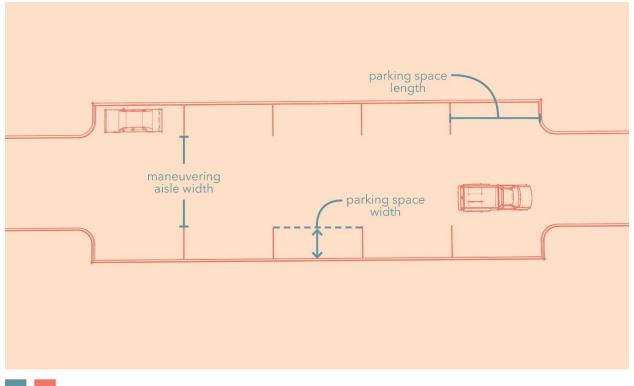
0° (PARALLEL) PARKING DIAGRAM
